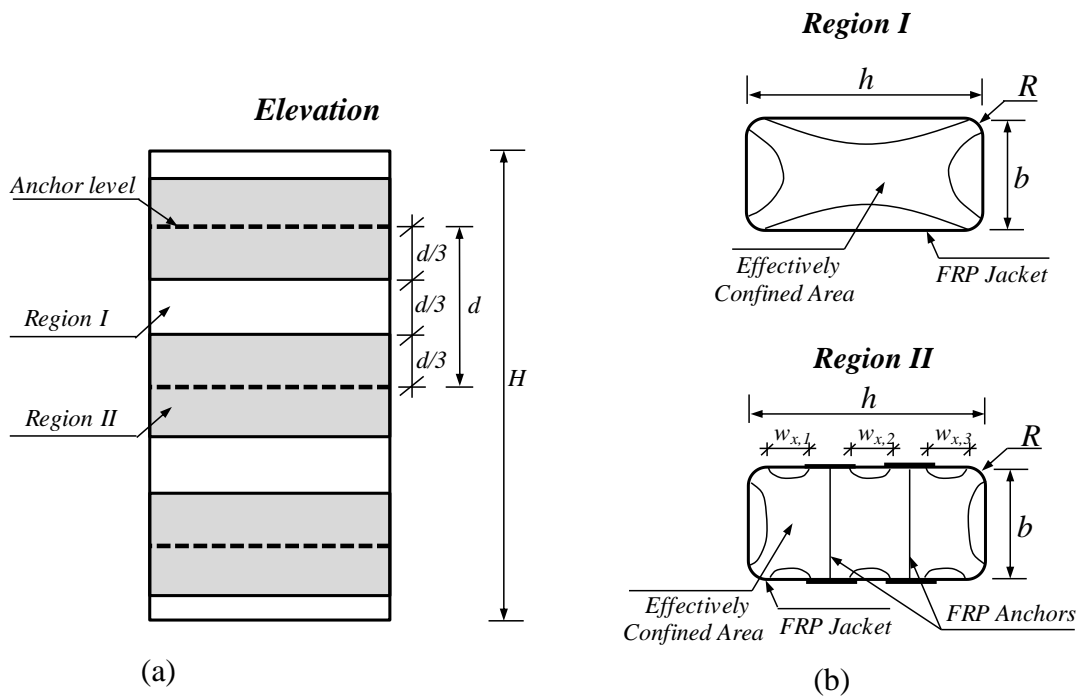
The two confinement regions of anchored specimens: (a) specimen elevation, (b) specimen cross section
